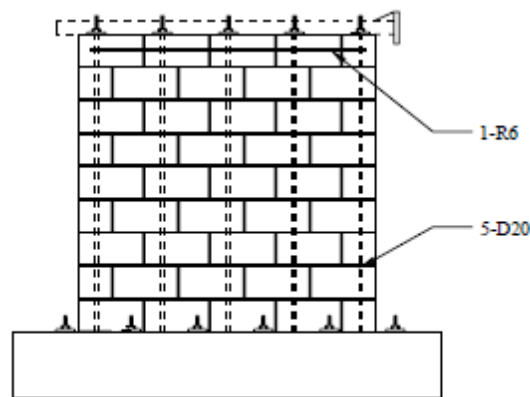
Reinforcing details of the wall tested by Voon (2007)
